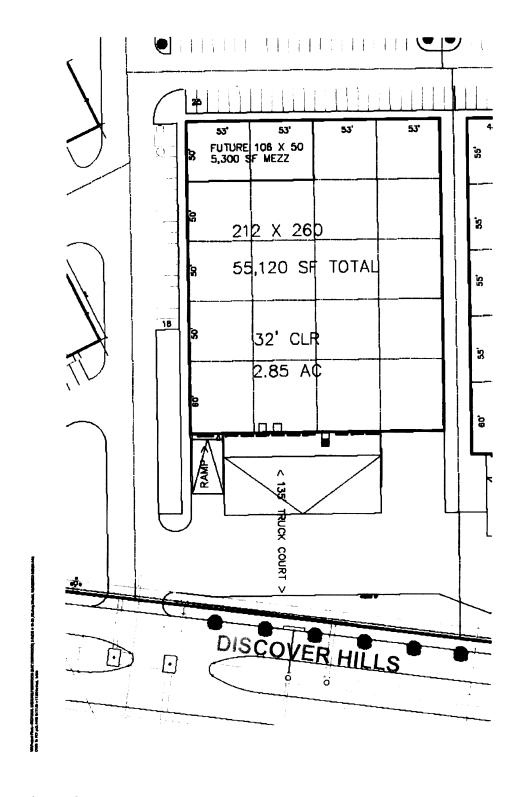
EXHIBIT A - SUPPORT DOCUMENTATION FOR REINVESTMENT ZONE OR SITE PLAN
